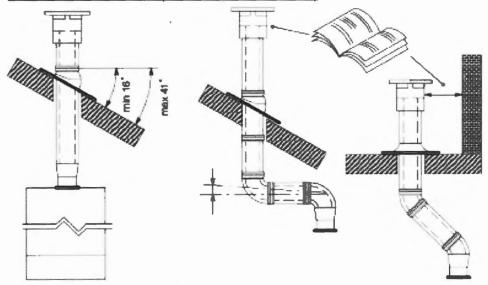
(vertical pipe φ 3.1 / φ 4.9 in)
